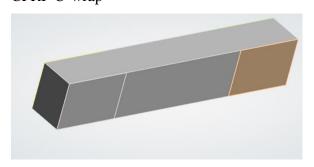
Modeling of beam with 400mm CFRP U-wrap
